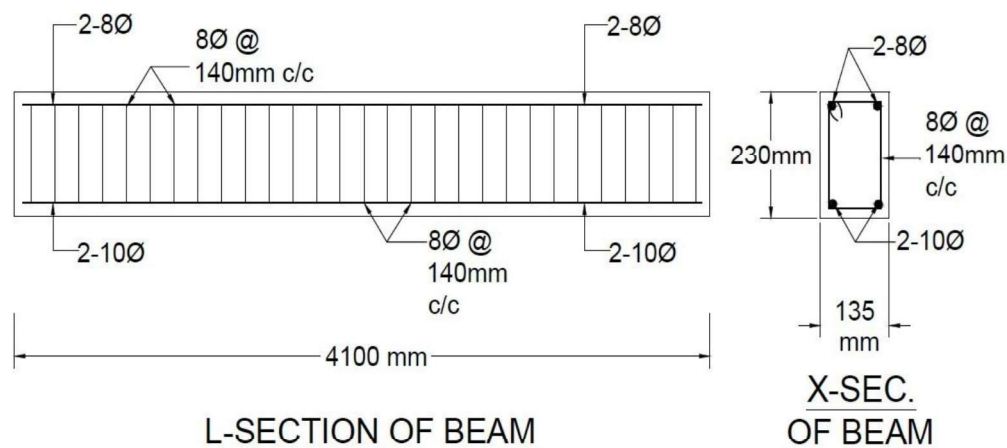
1 (a) L-section and (b) X-section of the beam specimens used in the study
